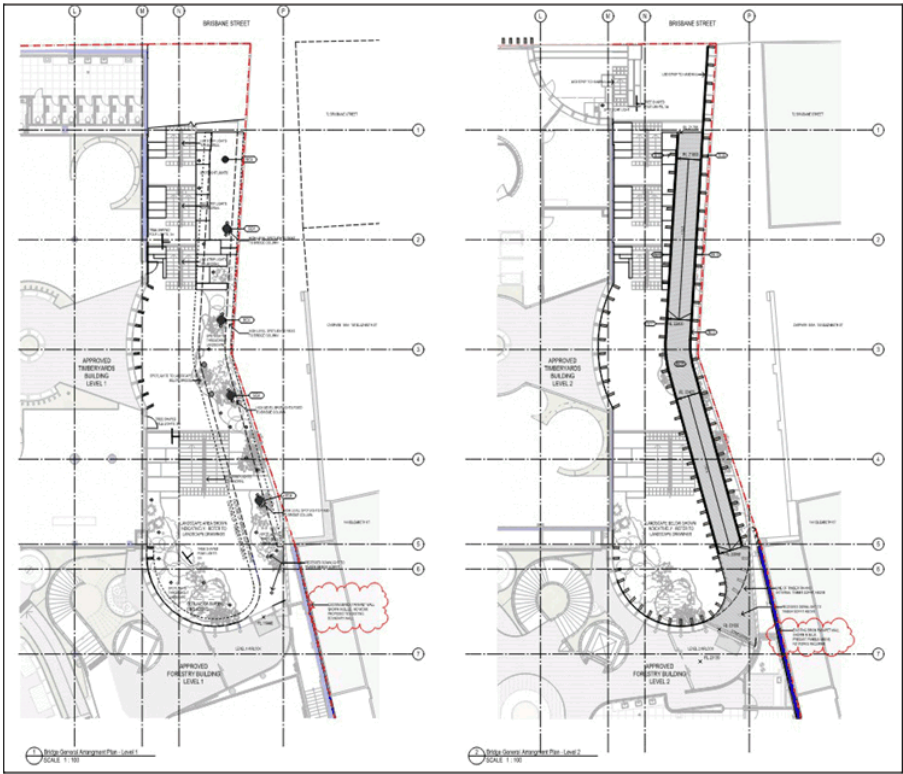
Ground and upper floor plan of laneway and proposed pedestrian bridge.
